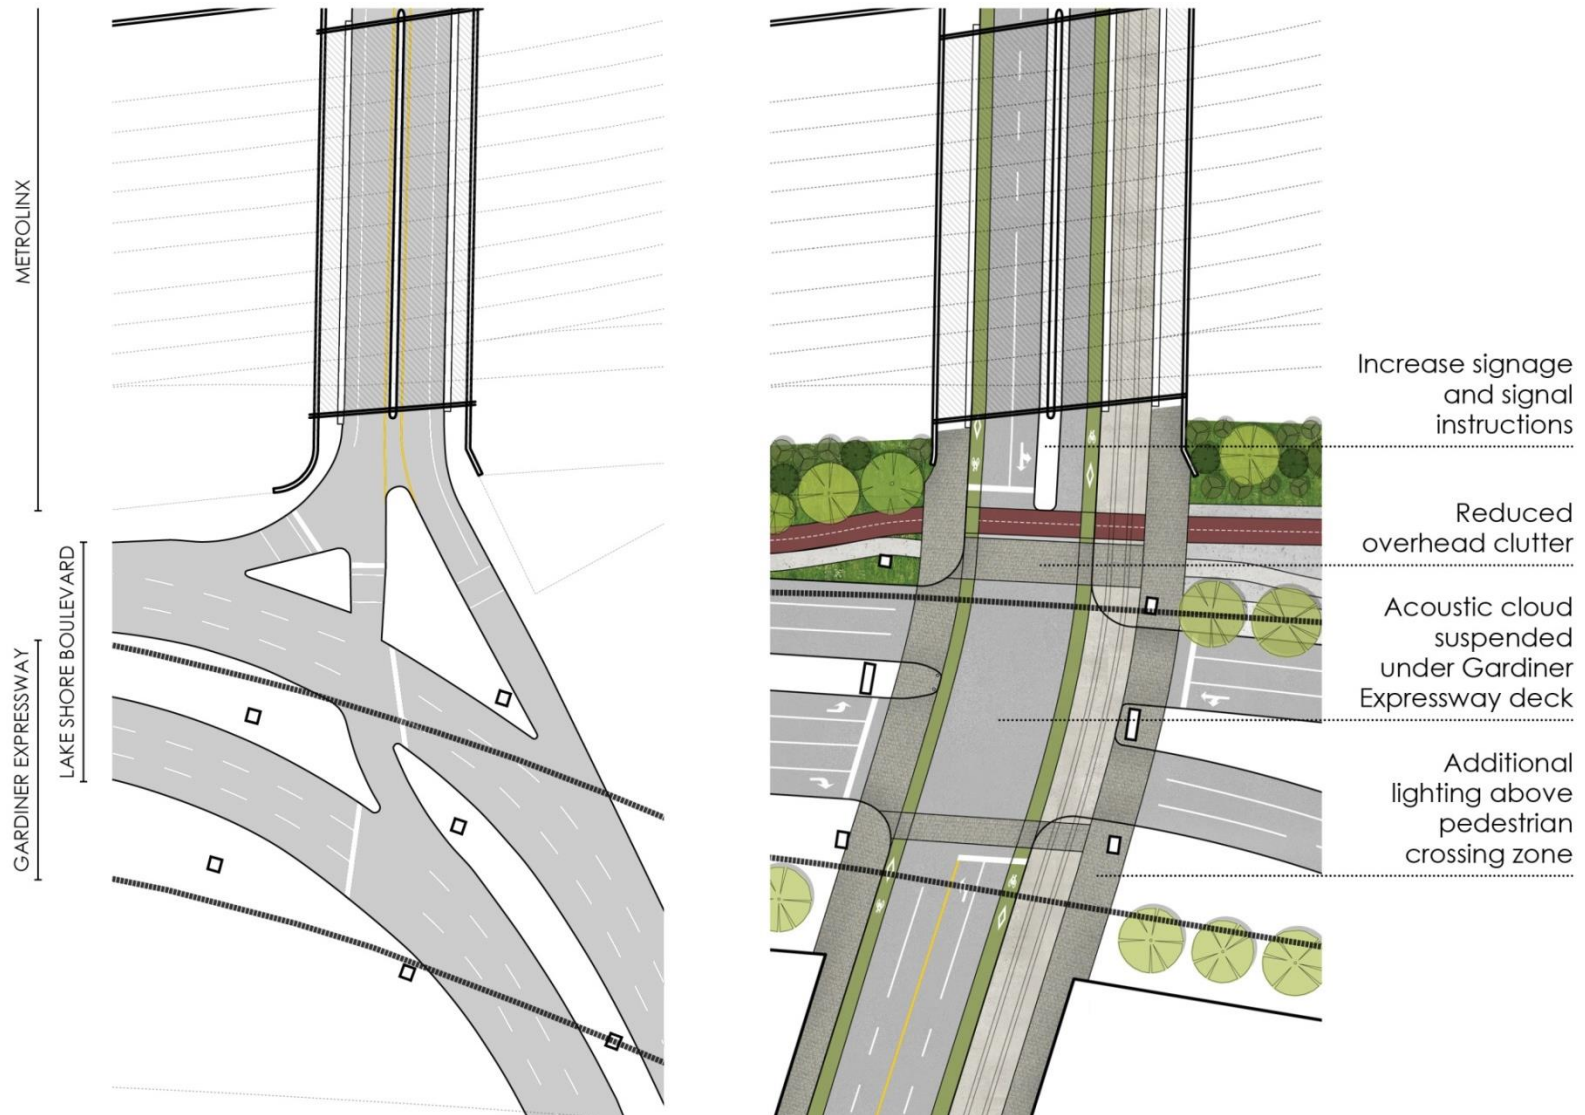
Cherry Street Intersection Concept (Alternatives 2 and 3)
